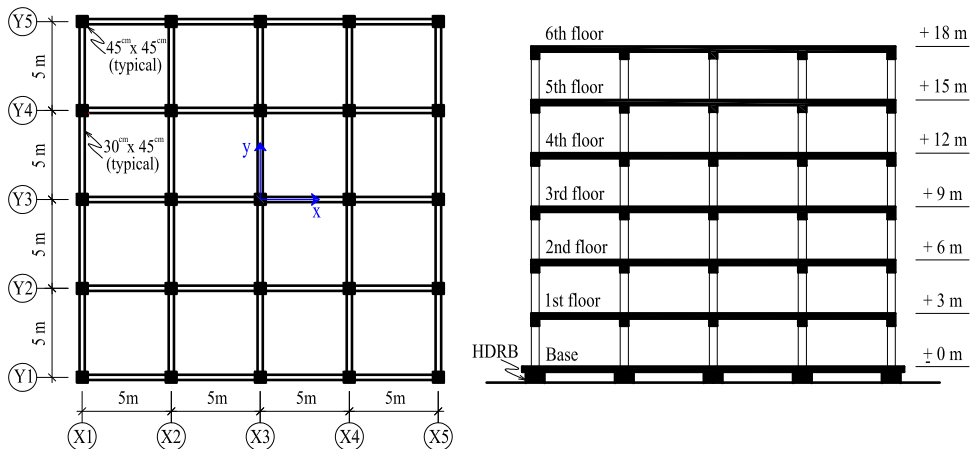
Typical floor plans and elevation views of the base-isolated buildings.
